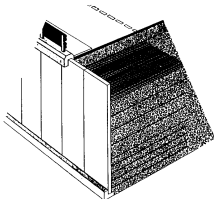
Proposed model of reinforced retaining wall using bi-axial stretch-made Tensar (SS-Type) (1984)
